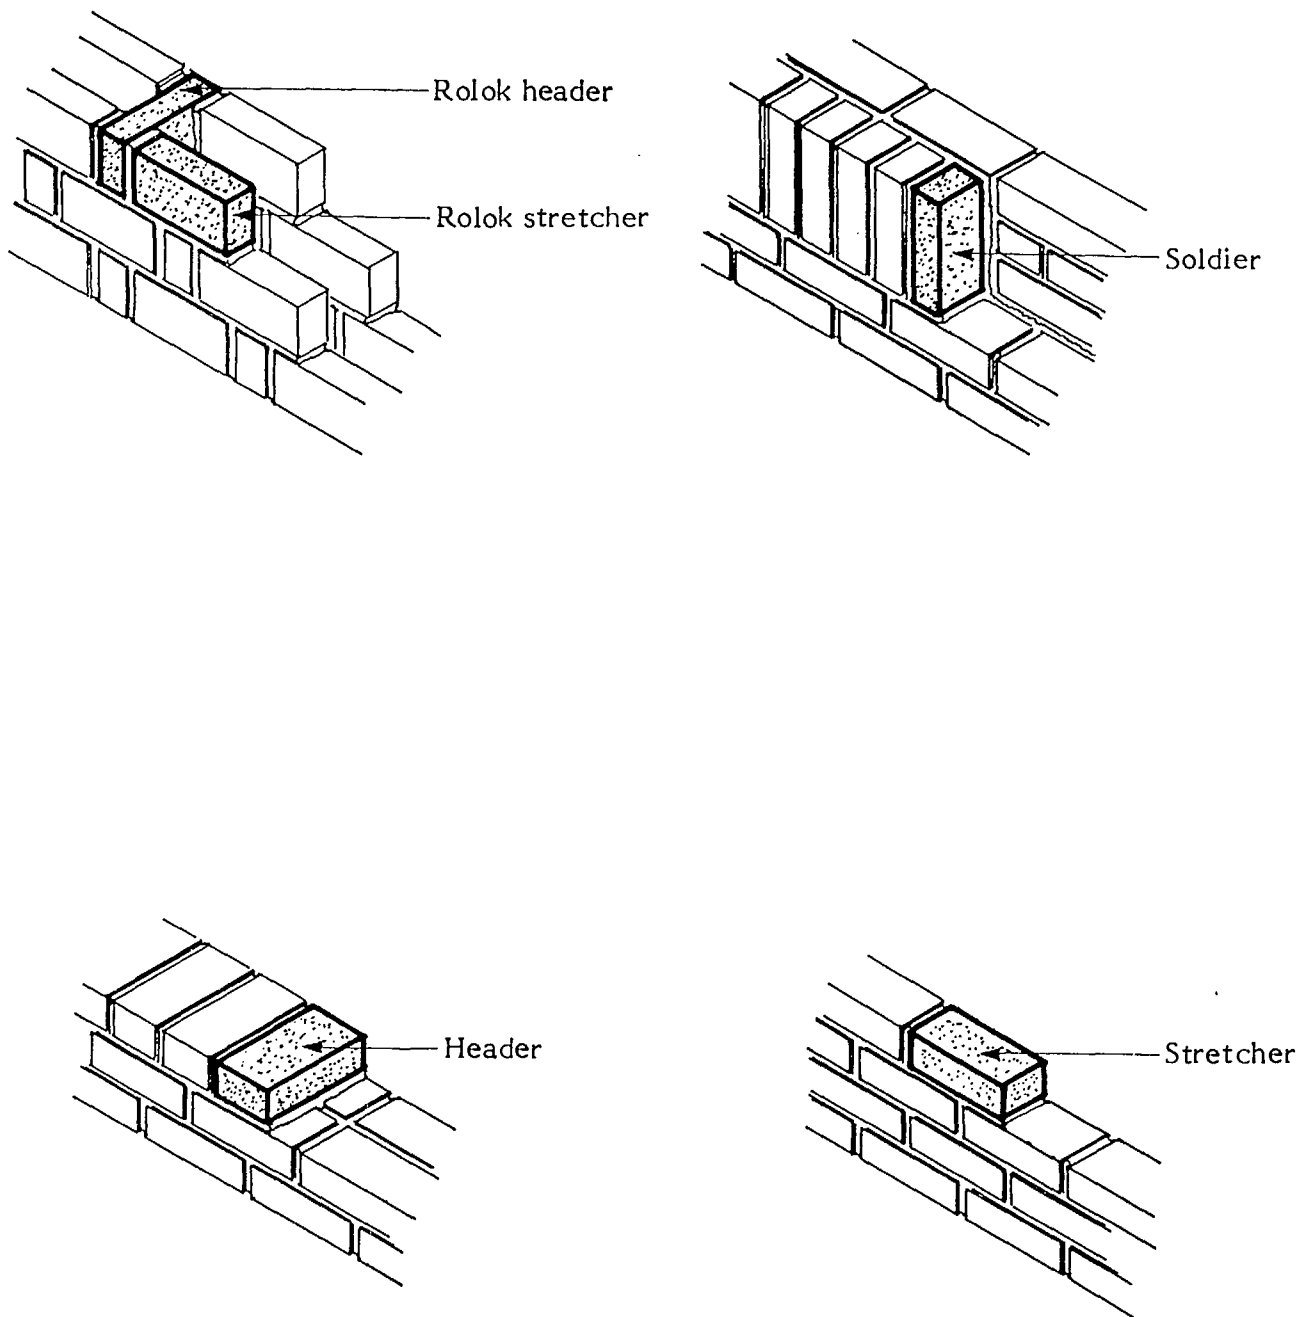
TERMS APPLIED TO BRICK WALL
